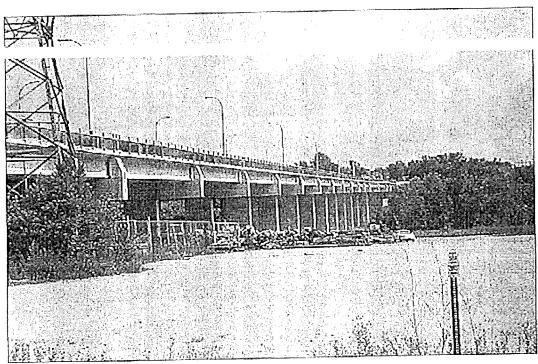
Modern box beam bridge connecting Kellogg Boulevard to Mounds Boulevard (facing northeast).
